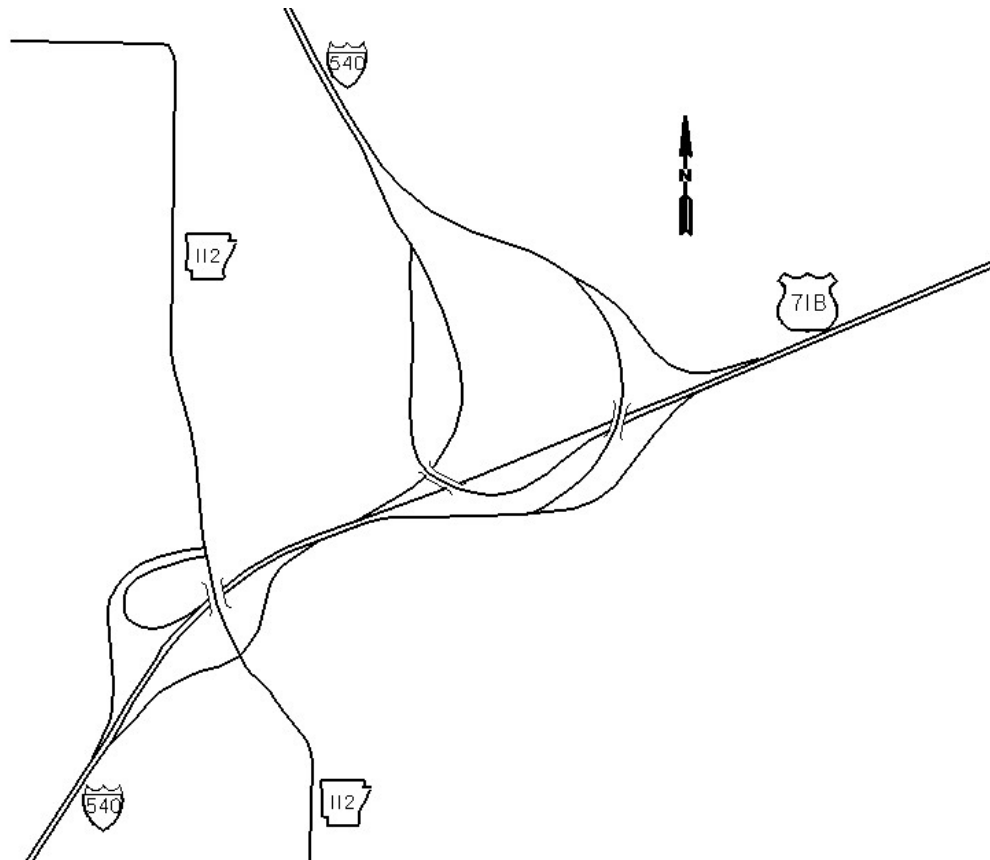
/ 67-1 — Existing Layout of Exits 66 and 67
